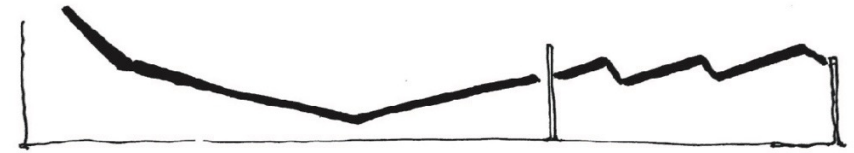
Roof Concept Maquettes (Author, June, 2021)
